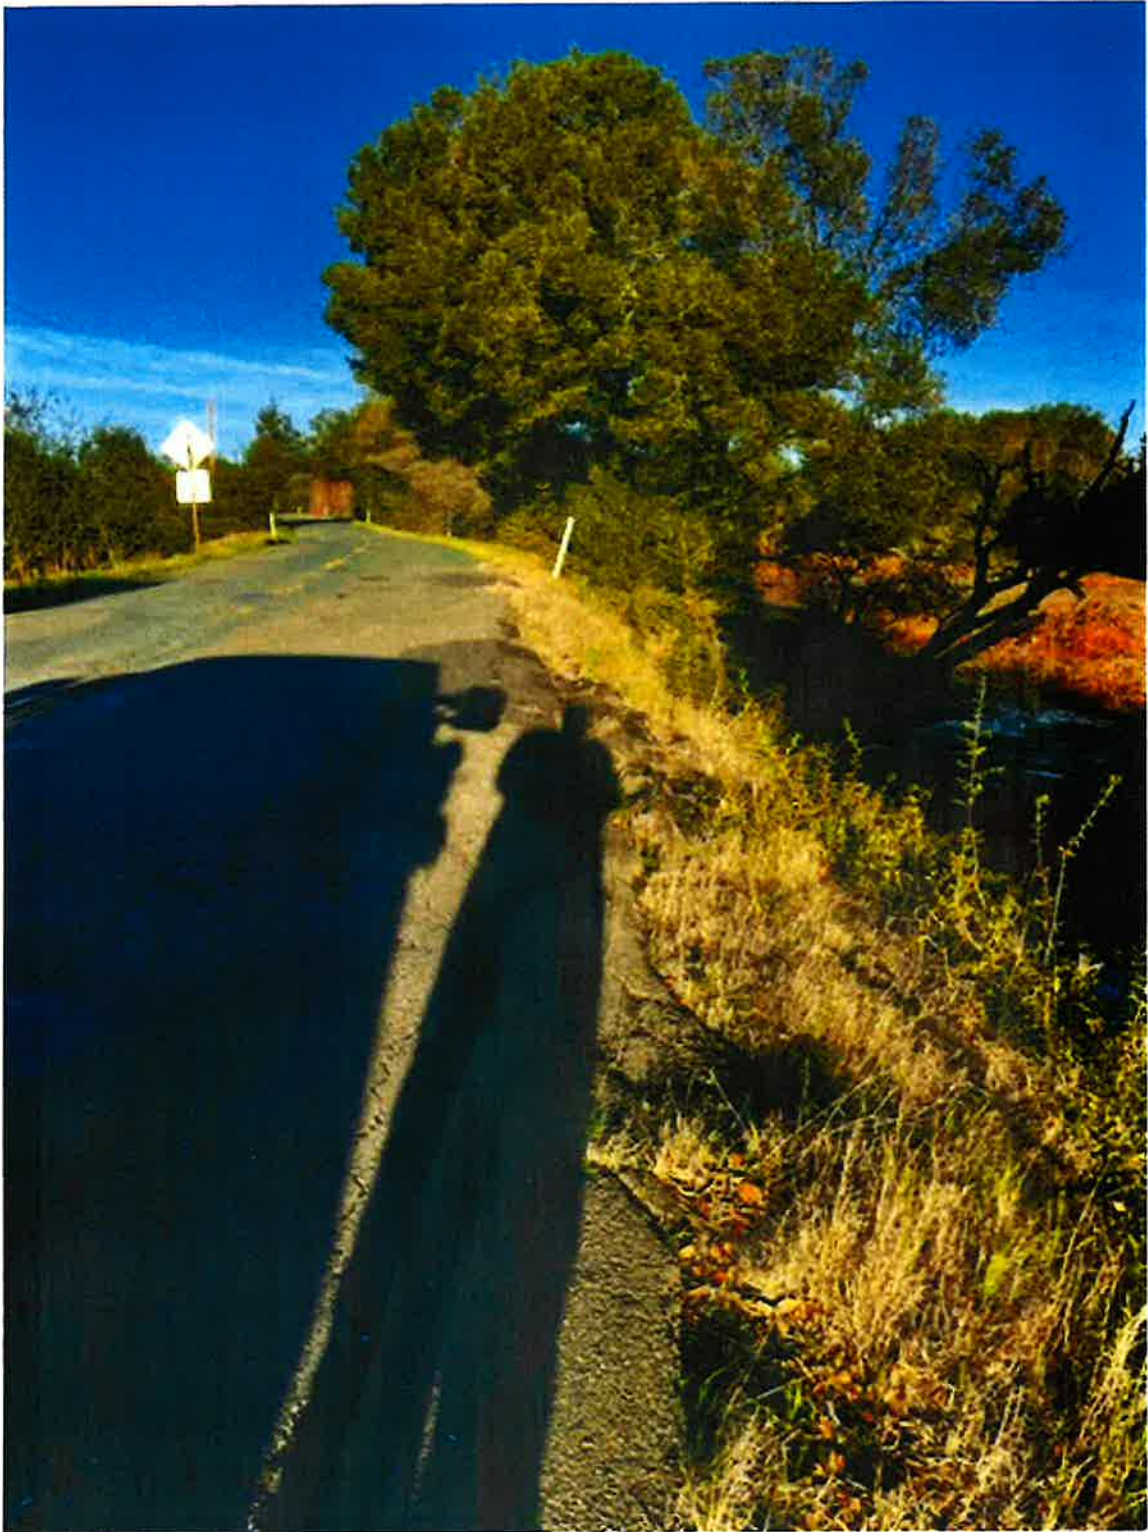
EXISTING DAMAGE SITE CONDITIONS
